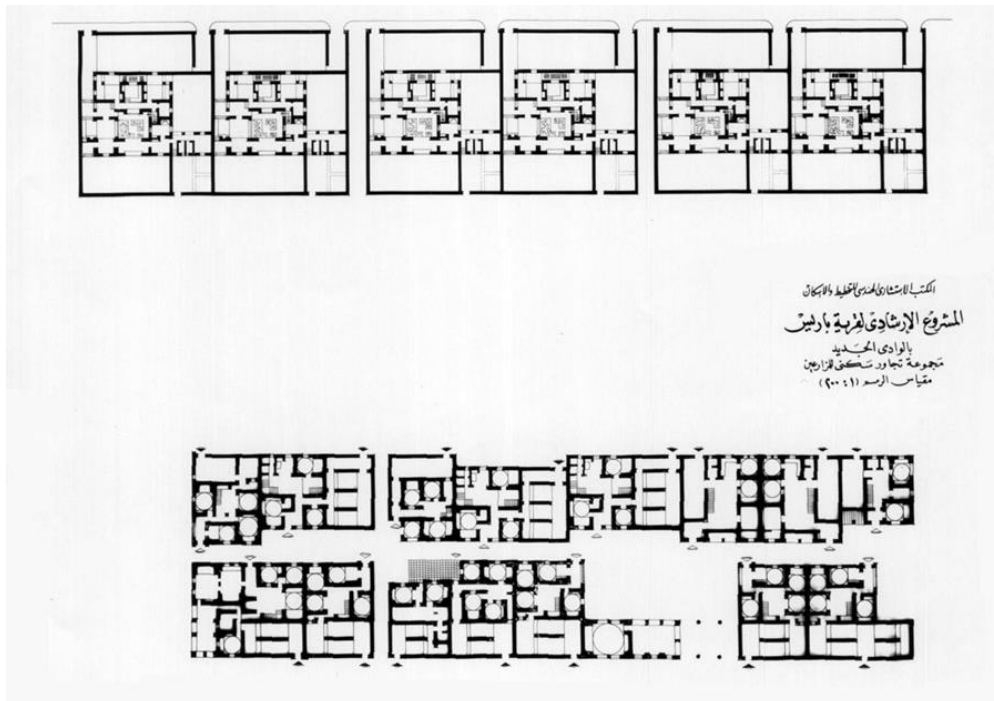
Farmer, non-farmers residences: design drawing: ground plan New Baris Village Kharga, Egypt
